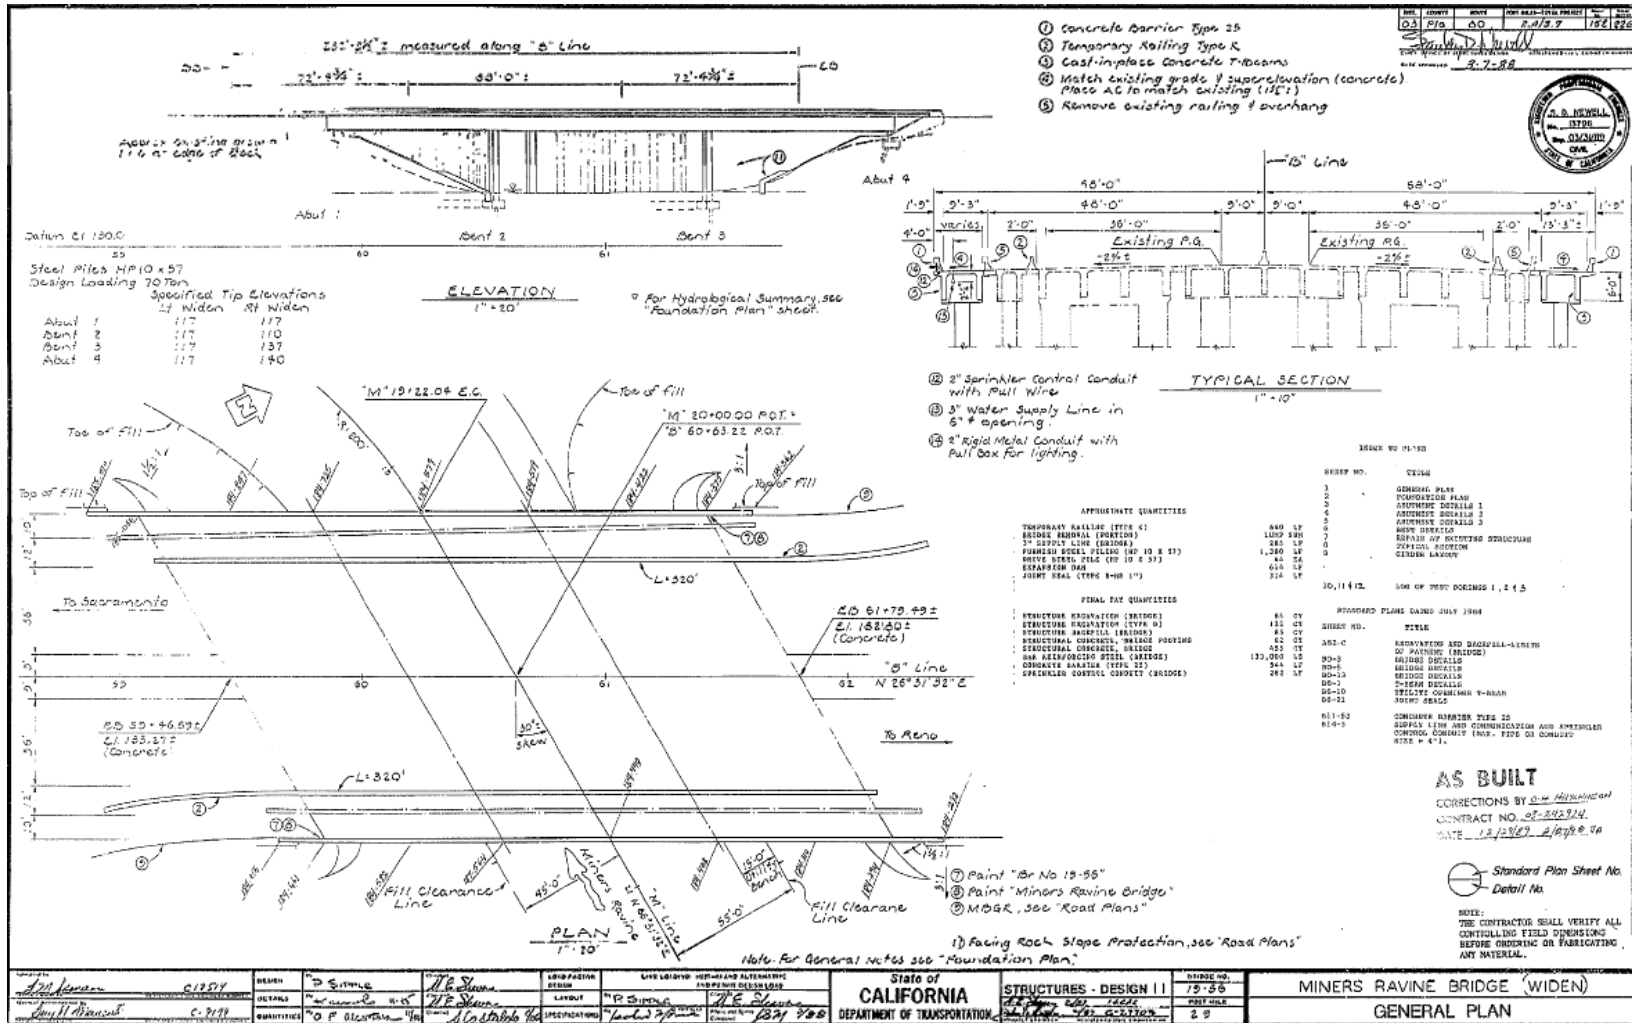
Miners Ravine Bridge at Miners Ravine As-built Plan (1988)
